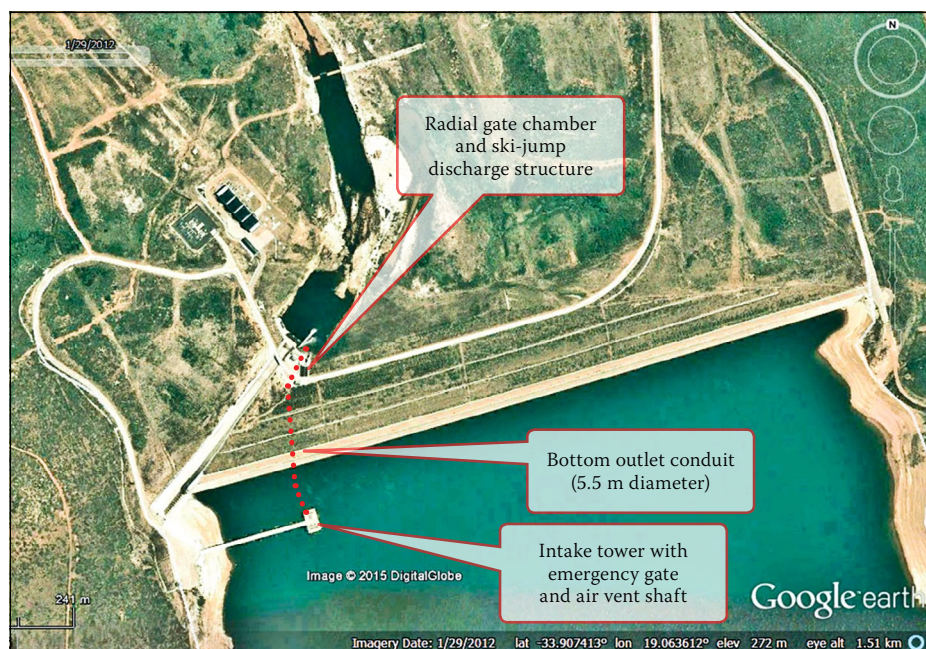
Berg River Dam wall with location of bottom outlet (Google Earth photograph)
